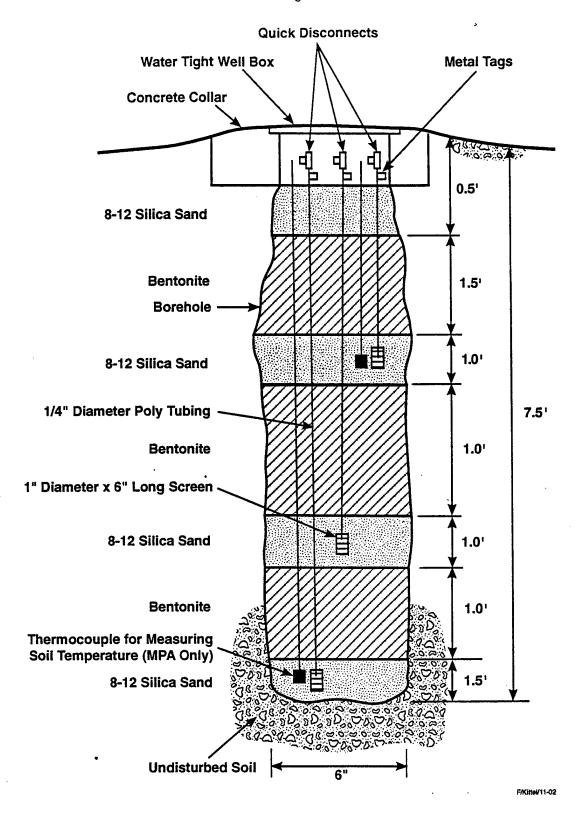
Schematic Diagram of a Typical Monitoring Point Construction at Site SS10
